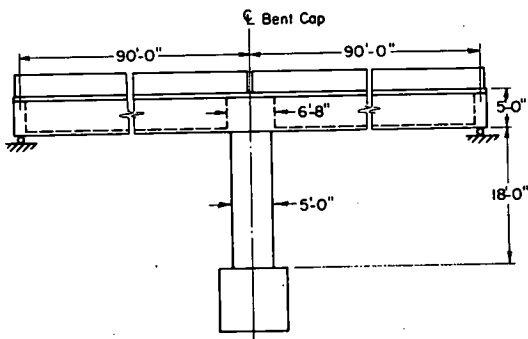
Cases 1-5, Part 2, Single-Column Bridge Elevation
